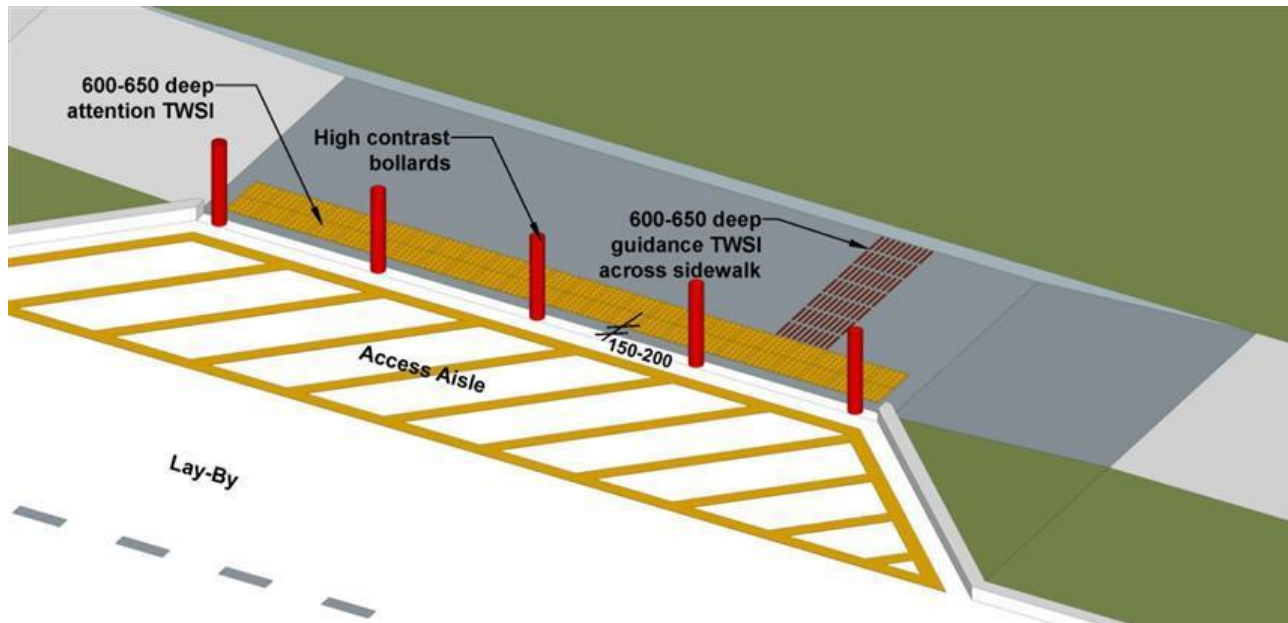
A depressed curb at a vehicular loading zone (From Web Site)
